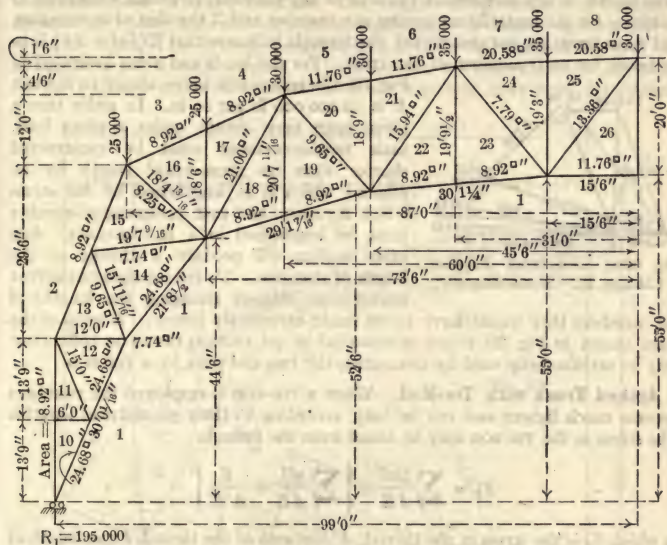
Live Stock Pavilion, Chicago, Ill. Truss-diagram
